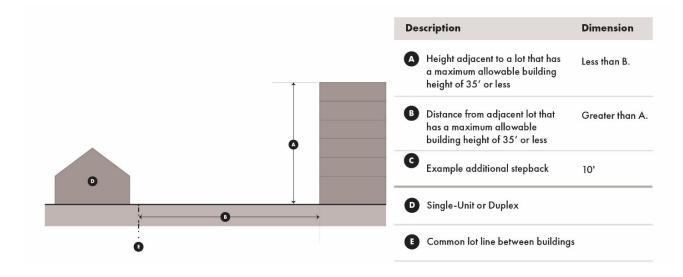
W: Example of 65 ft tall building adjacent to a lot that has a maximum building height of 35' or less (or separated by an alley) which does not require upper floor step-backs because it has a horizontal distance from the common lot line greater than the height of the building.
